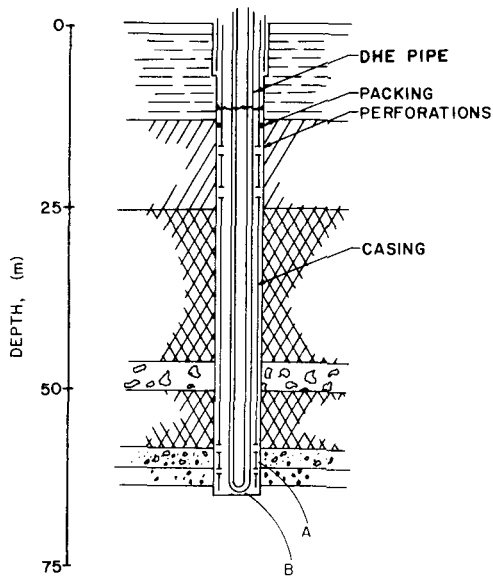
Typical downhole heat exchanger (DHE) installation (from Culver and Reistad, 1979).
